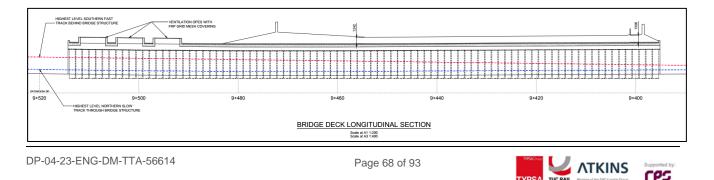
South Circular Road Buried Portal Bridge (OBC1A) General Arrangement
